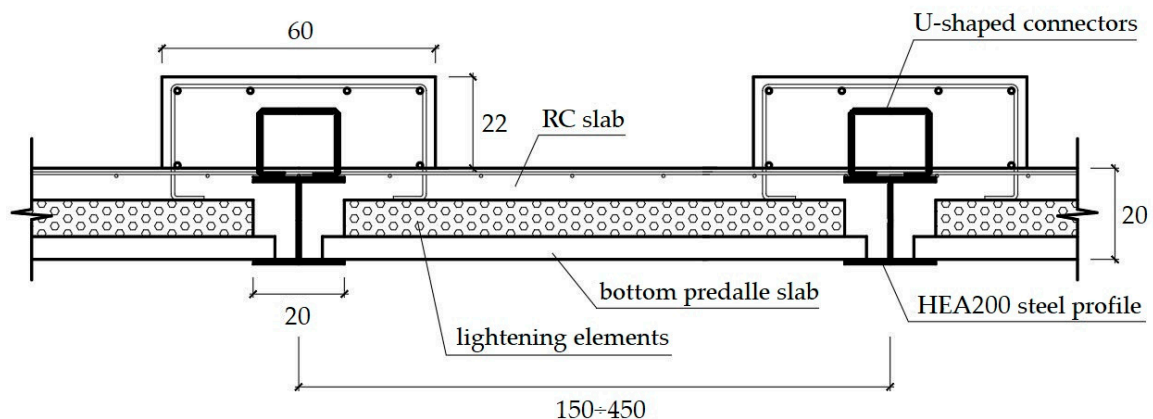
Connection between the floor and the top beams of the radial trusses (dimensions are in cm).
